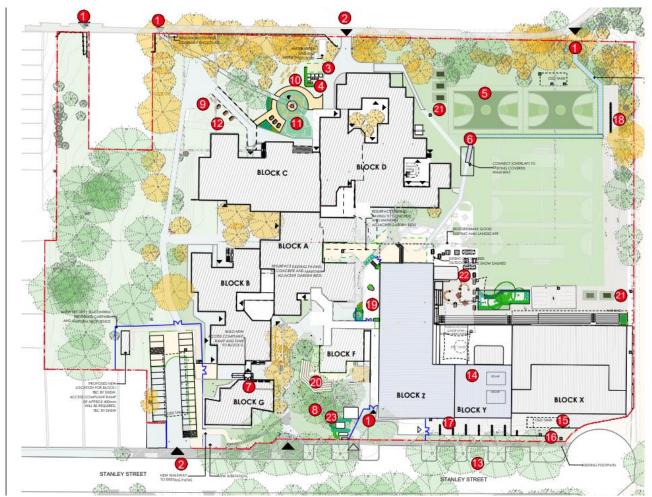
Extract from Proposed Landscape Plan (JDH Architects)
